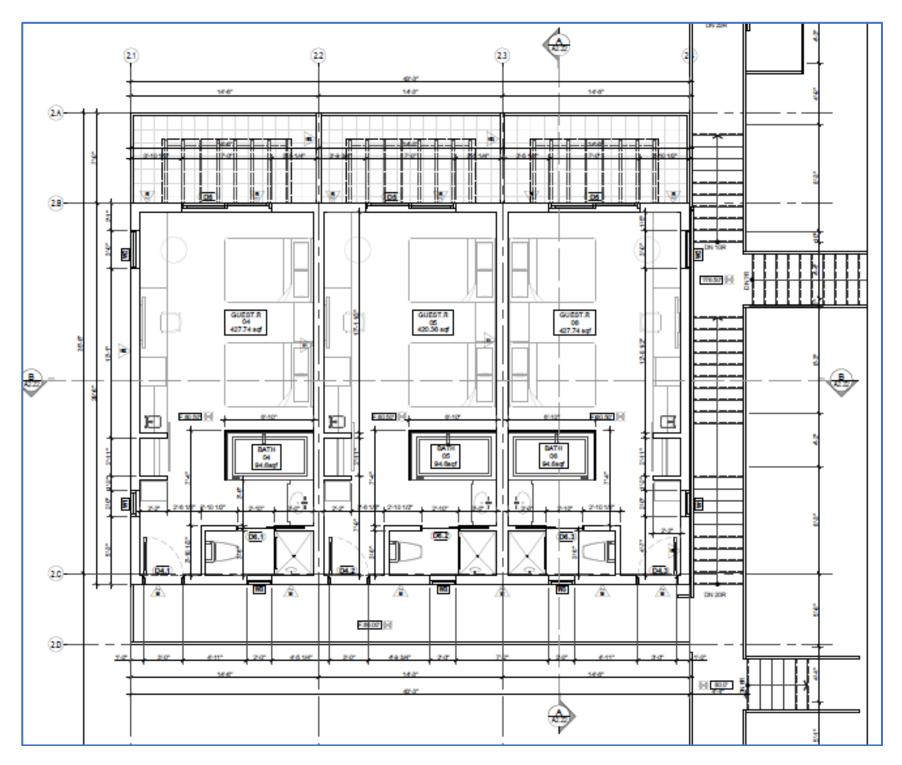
Upper floor of the North and South wings in the *Proposed Development* (refer to Buildings 3 and 4 in Figure 3 for a 3D rendering of the structures). The upper floor of the North and the South wings will have the same floor configuration. This floor will house smaller guestrooms than the ones in the Centre wing. *Image modified from HNPA Architecture+Planning Inc. by Coastal Raintree Consulting, Ltd.
